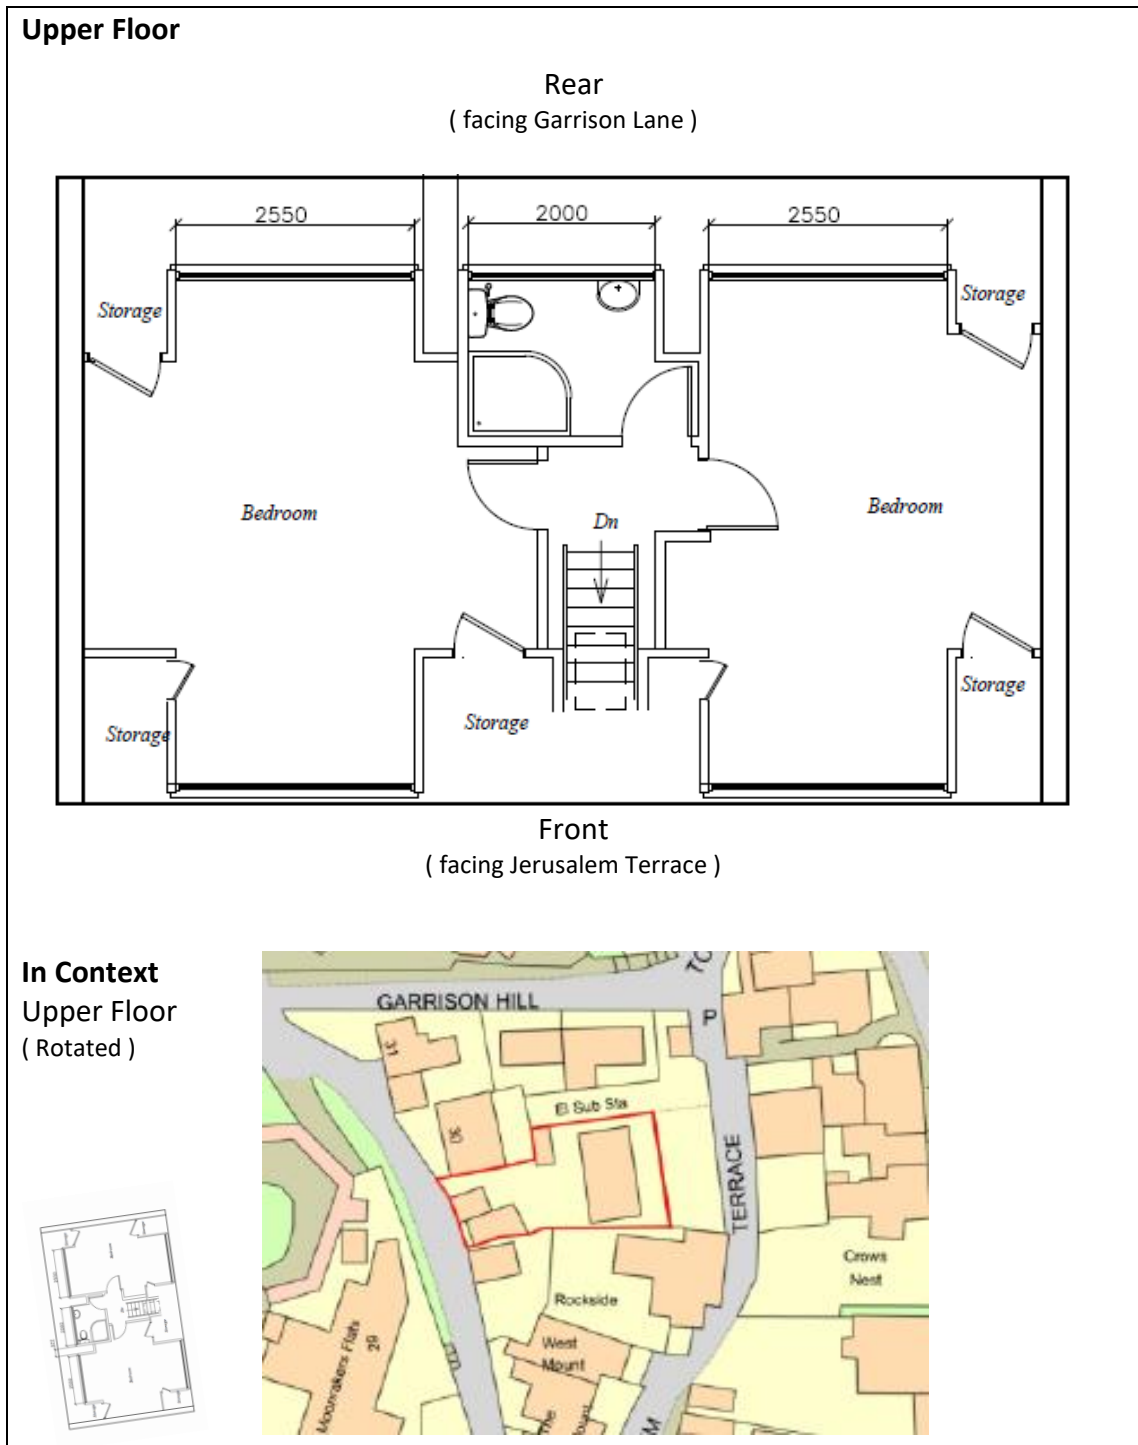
Proposed Site Layout (extracted from submitted plans)
